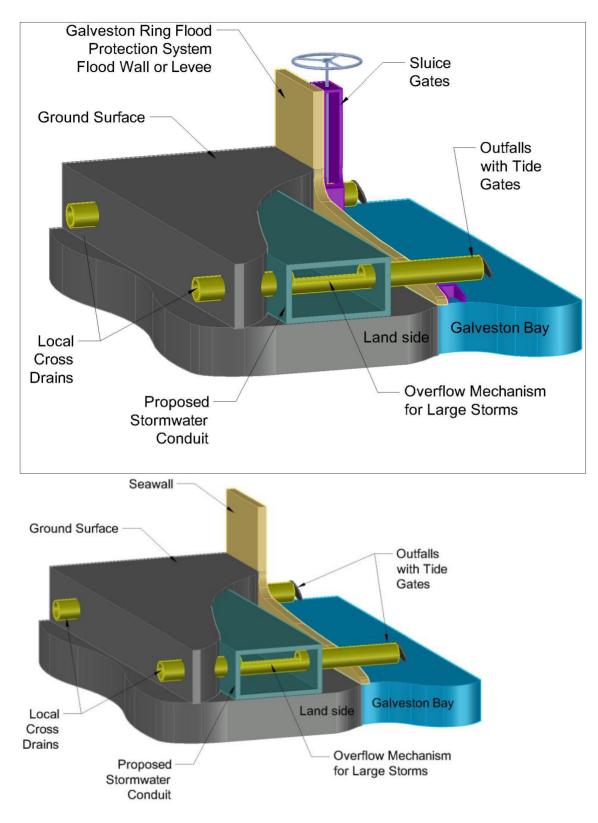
Proposed stormwater conduit connection with existing drainage network.
